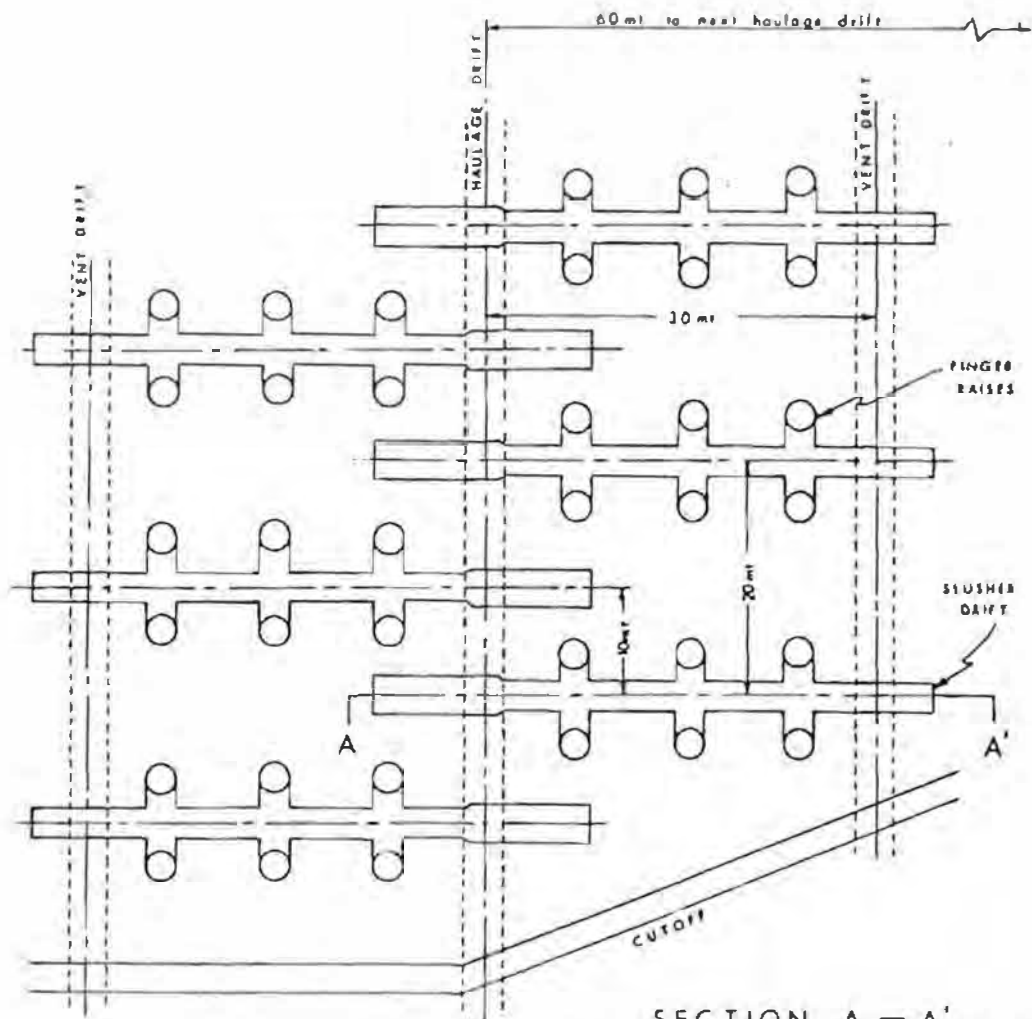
Typical Gravity Caving Scheme (From Pillar, 1981, p. 90) Dimensions and layout details may vary from mine to mine (m = meters). Used with permission of the Society of Mining Engineers, of AIME.
